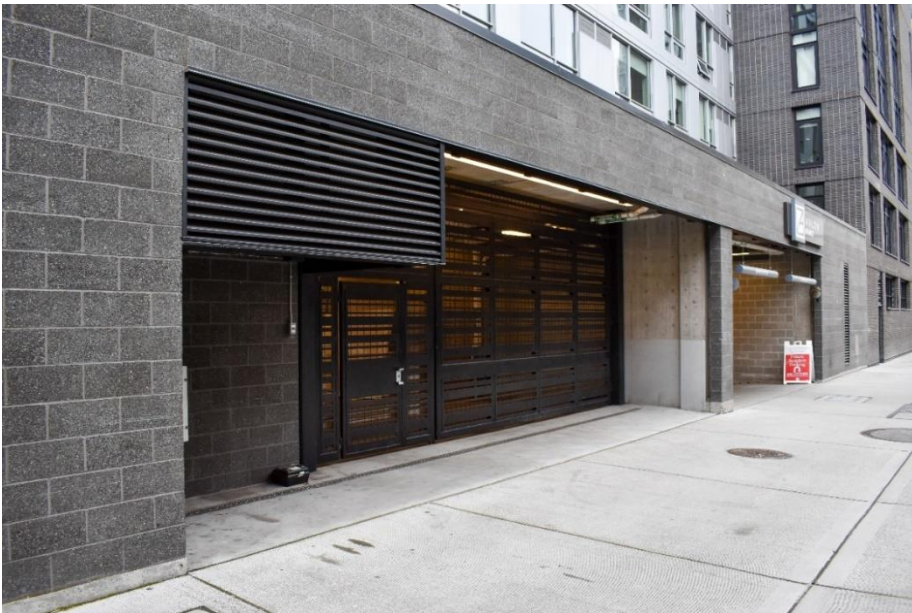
Front curb at Avalon Belltown Apartment Building
